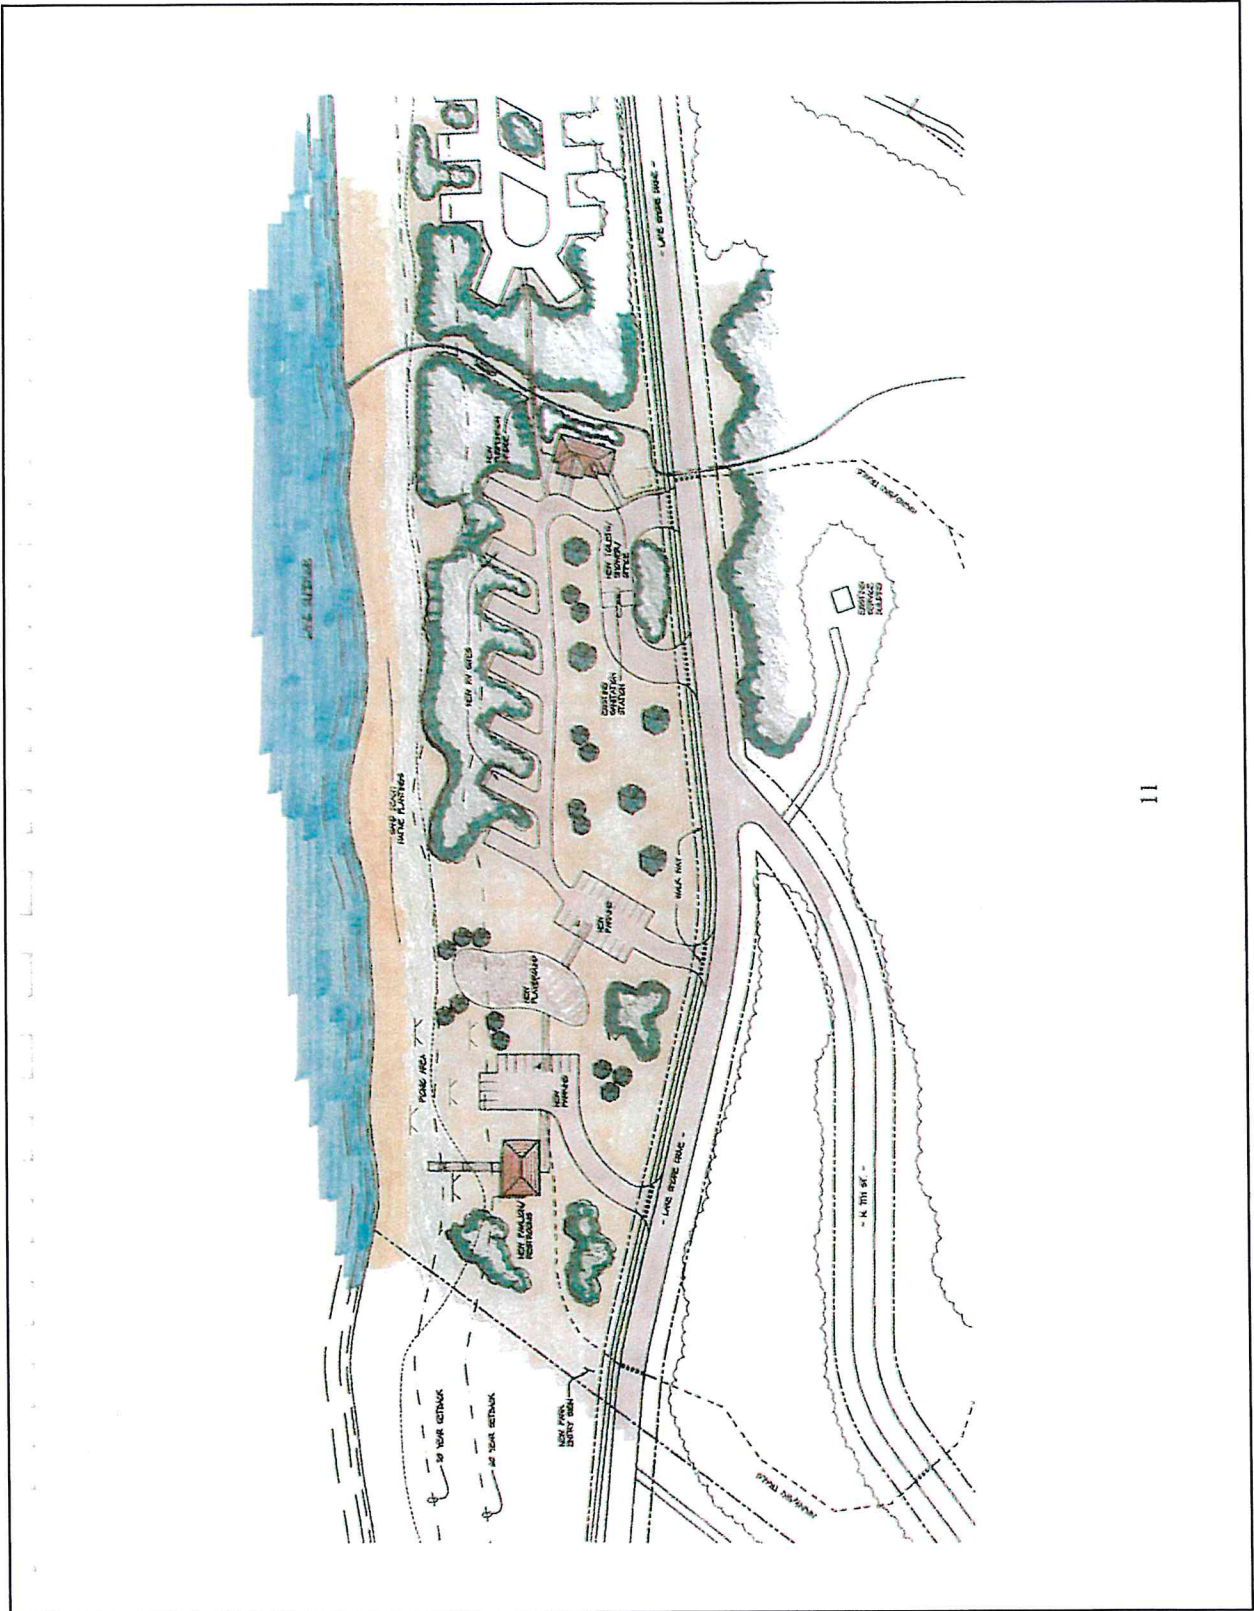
2005 Ontonagon Township Park Site Plan Map
